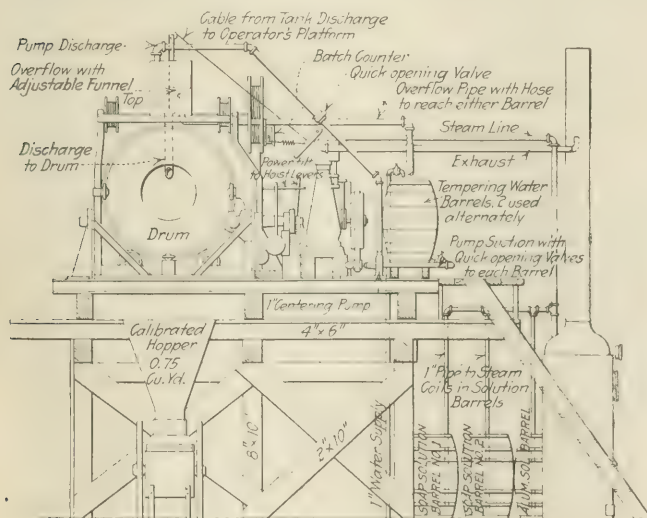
CONCRETE-MIXING PLANT WITH ATTACHMENT FOR ADDING WATERPROOFING TO MIX
